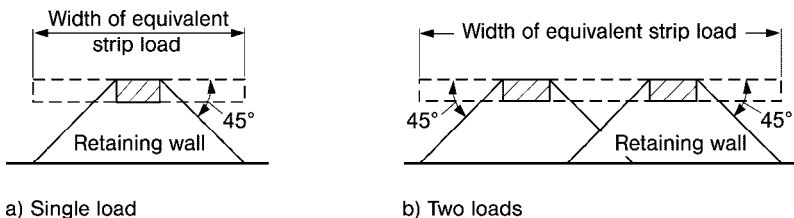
Conversion of bounded distributed loads to strip loads
